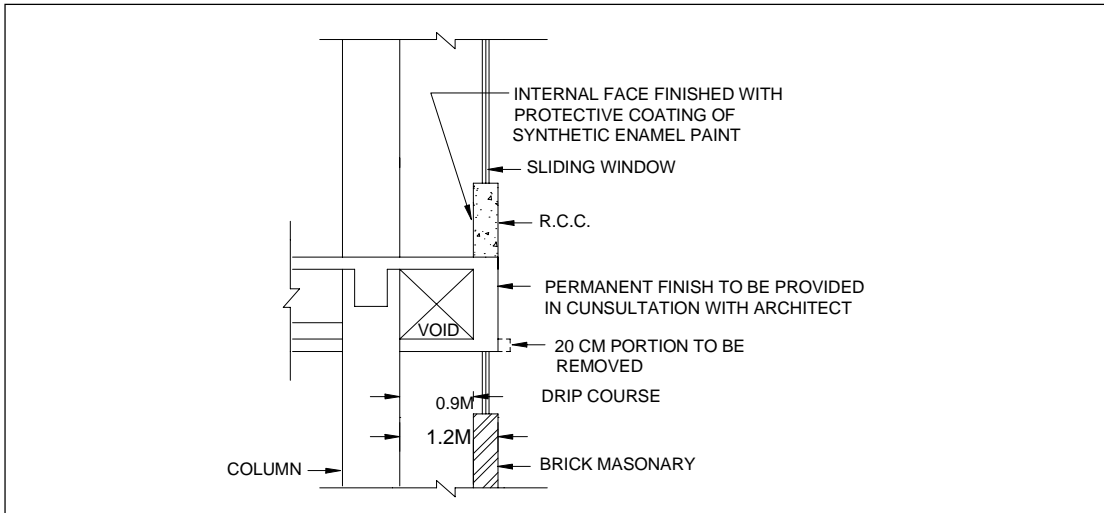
Proposed Arrangement Stiffened Cantilevered Portion in Front
